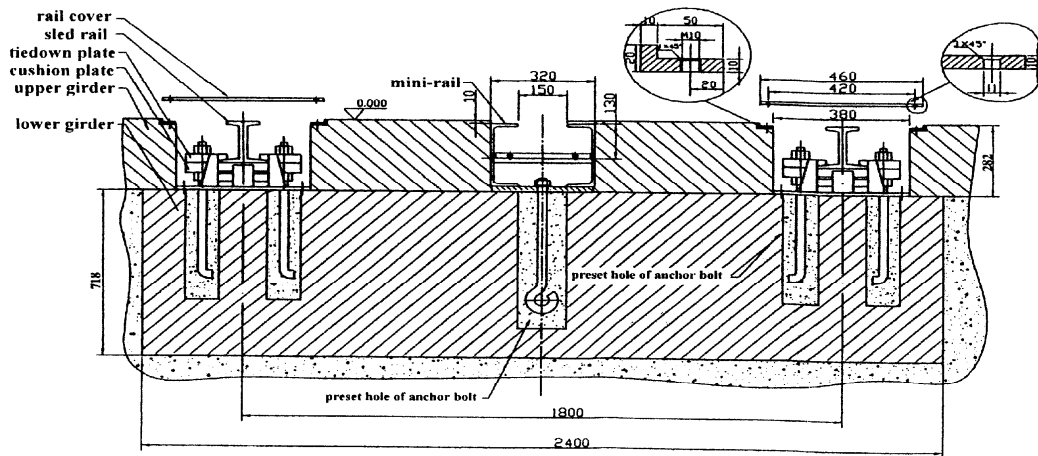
Cross-section View of the Mini-Rail (Geometric Dimensioning unit is mm)
